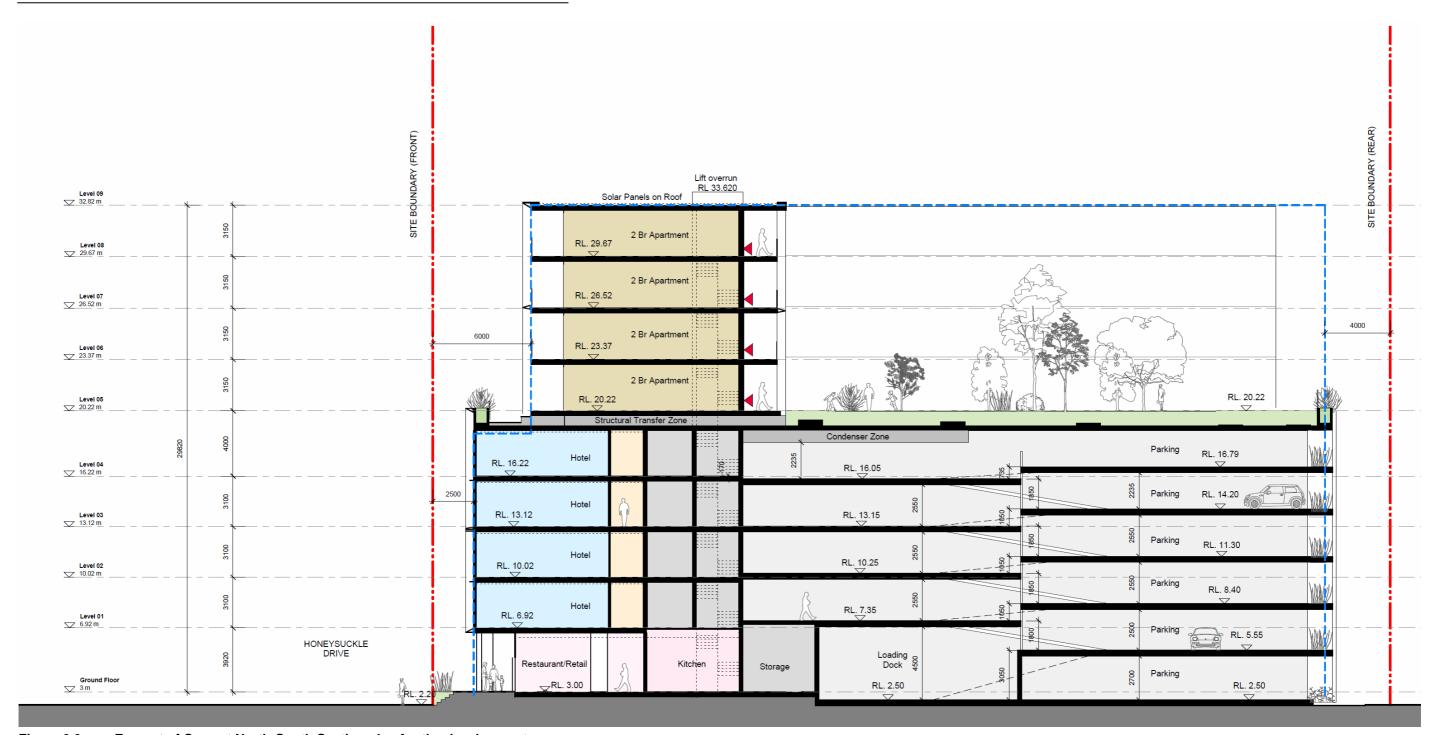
Excerpt of Current North-South Section plan for the development.
